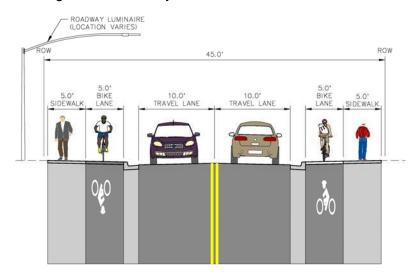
W. 30th Ave. (Spenard Road to Arctic Blvd.) - Alt. A
